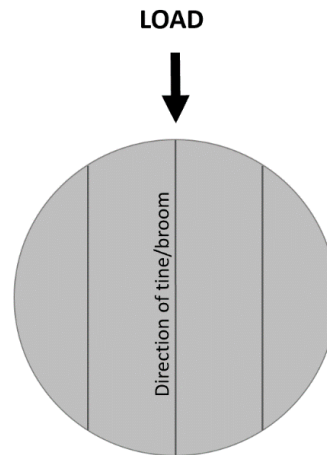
Direct shear test orientation for precast specimen loaded parallel to the roughening direction.
